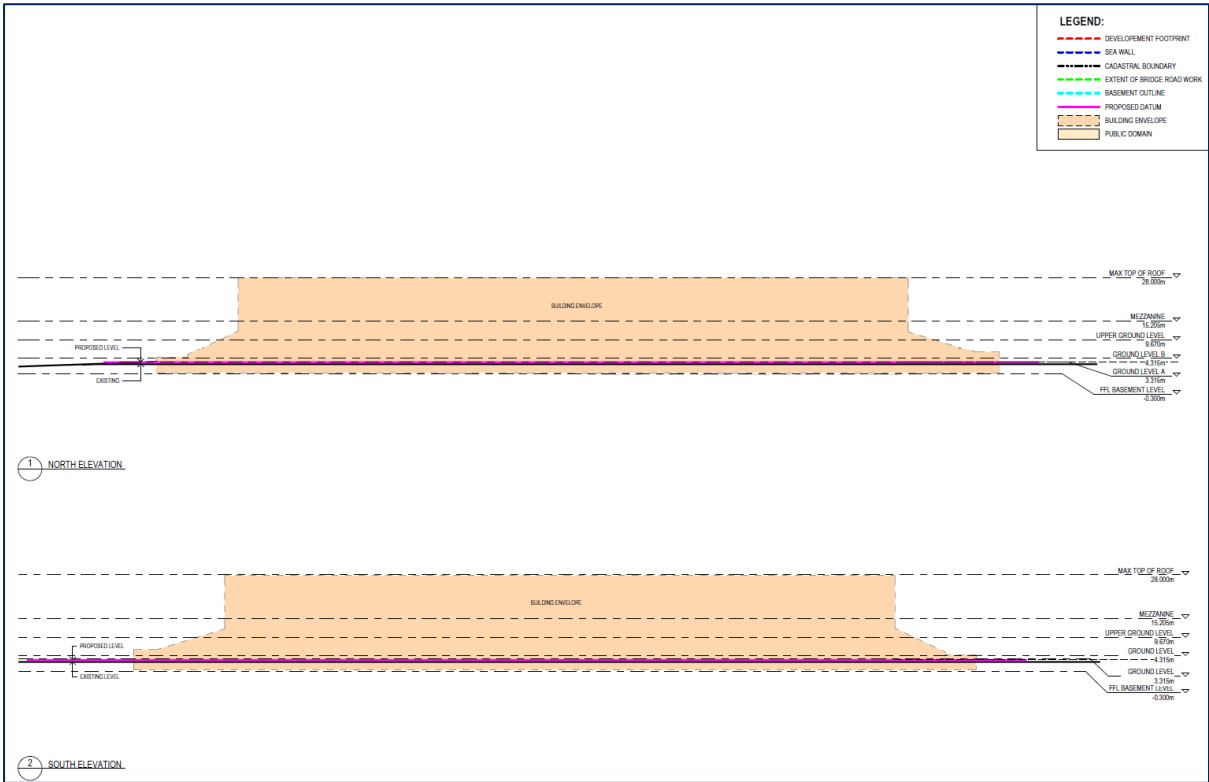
| Extract of the Building Envelope Plan – North and South Elevation (Source: EIS)
